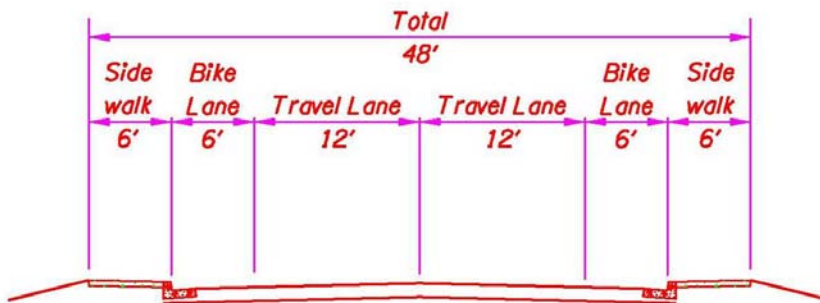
Alternative B and C Cross Section (from Parrell Road to the Railroad over crossing)
